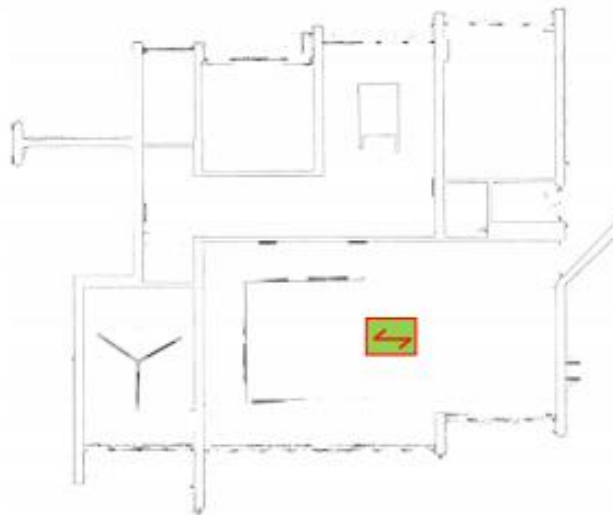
Slab direction\_forth structural floor (ORD\_S\_01)
